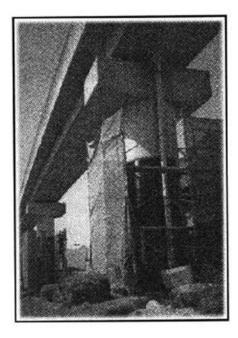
Method of Strengthen In situ with carbon fibre (Techniques of Seismic Strengthening for Concrete Structures)
